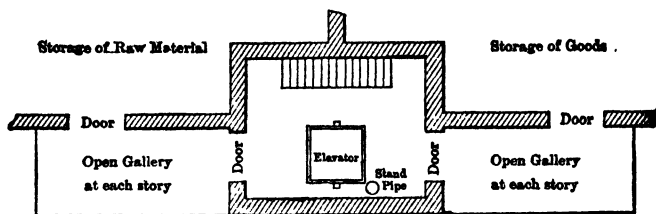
Stairway-tower and Galleries at Side of Storehouse
